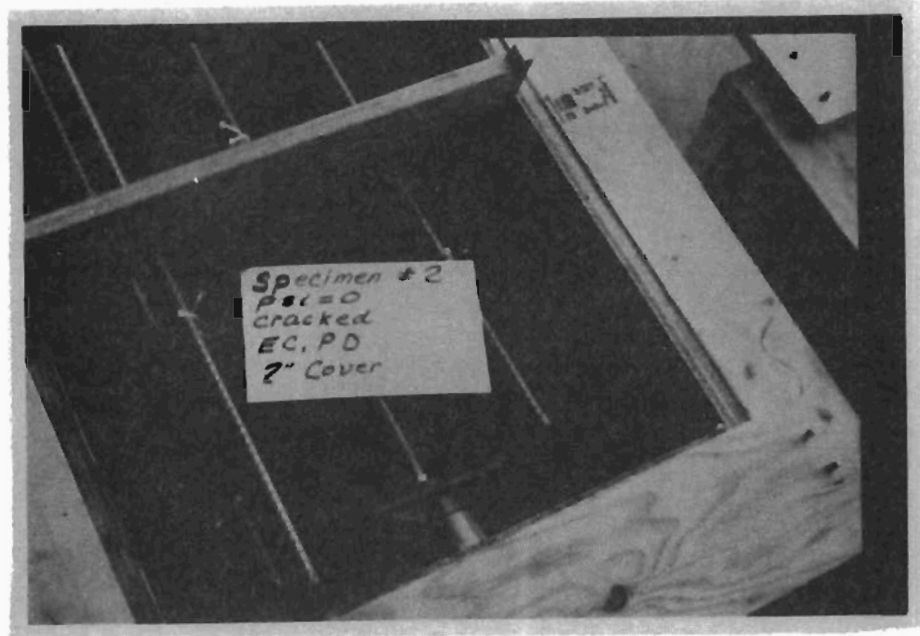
Anchorage casting and pocket former on stressing end of unbonded specimen
